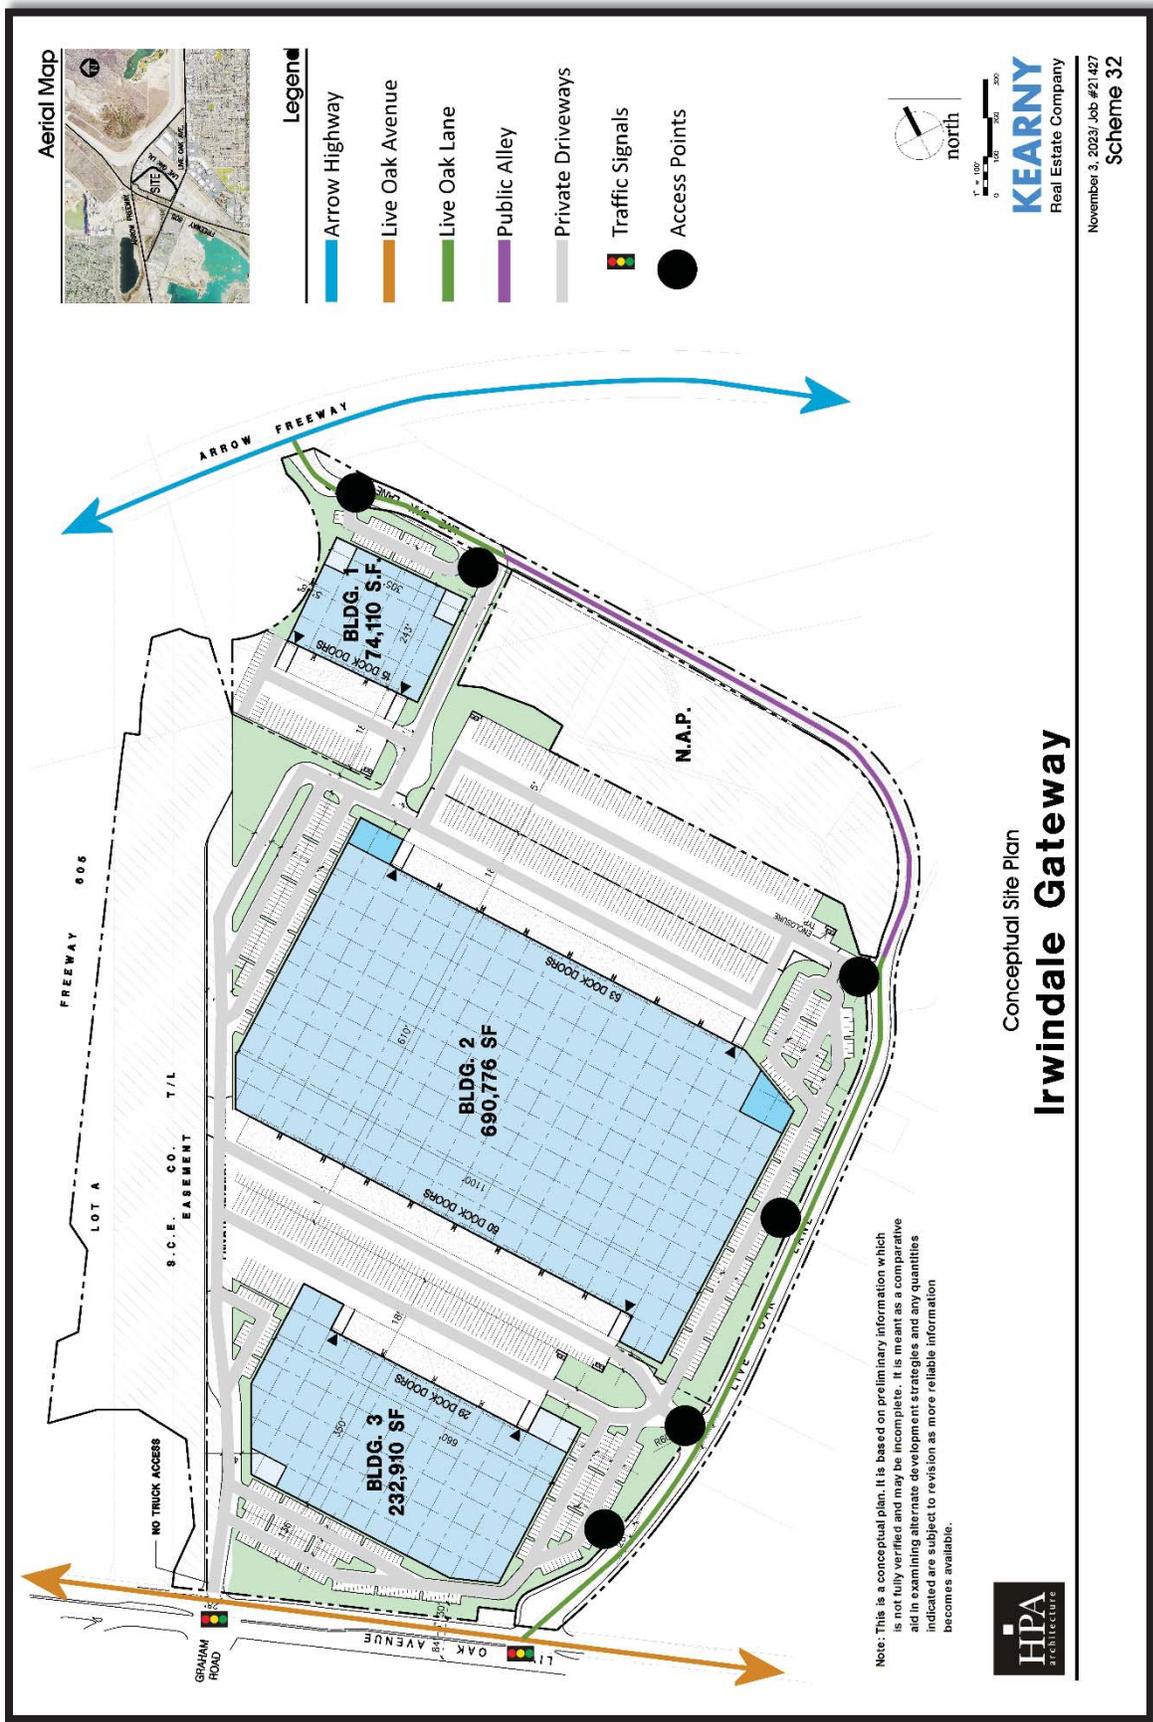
CONCEPTUAL CIRCULATION PLAN ~~WITHOUT BESS~~
